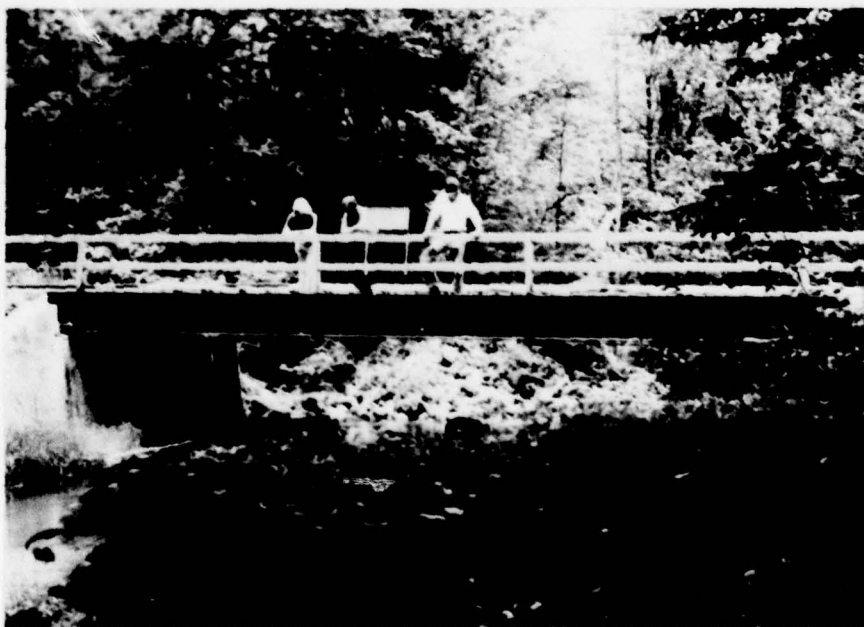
View of railroad bridge 1,700 feet downstream of dam.
